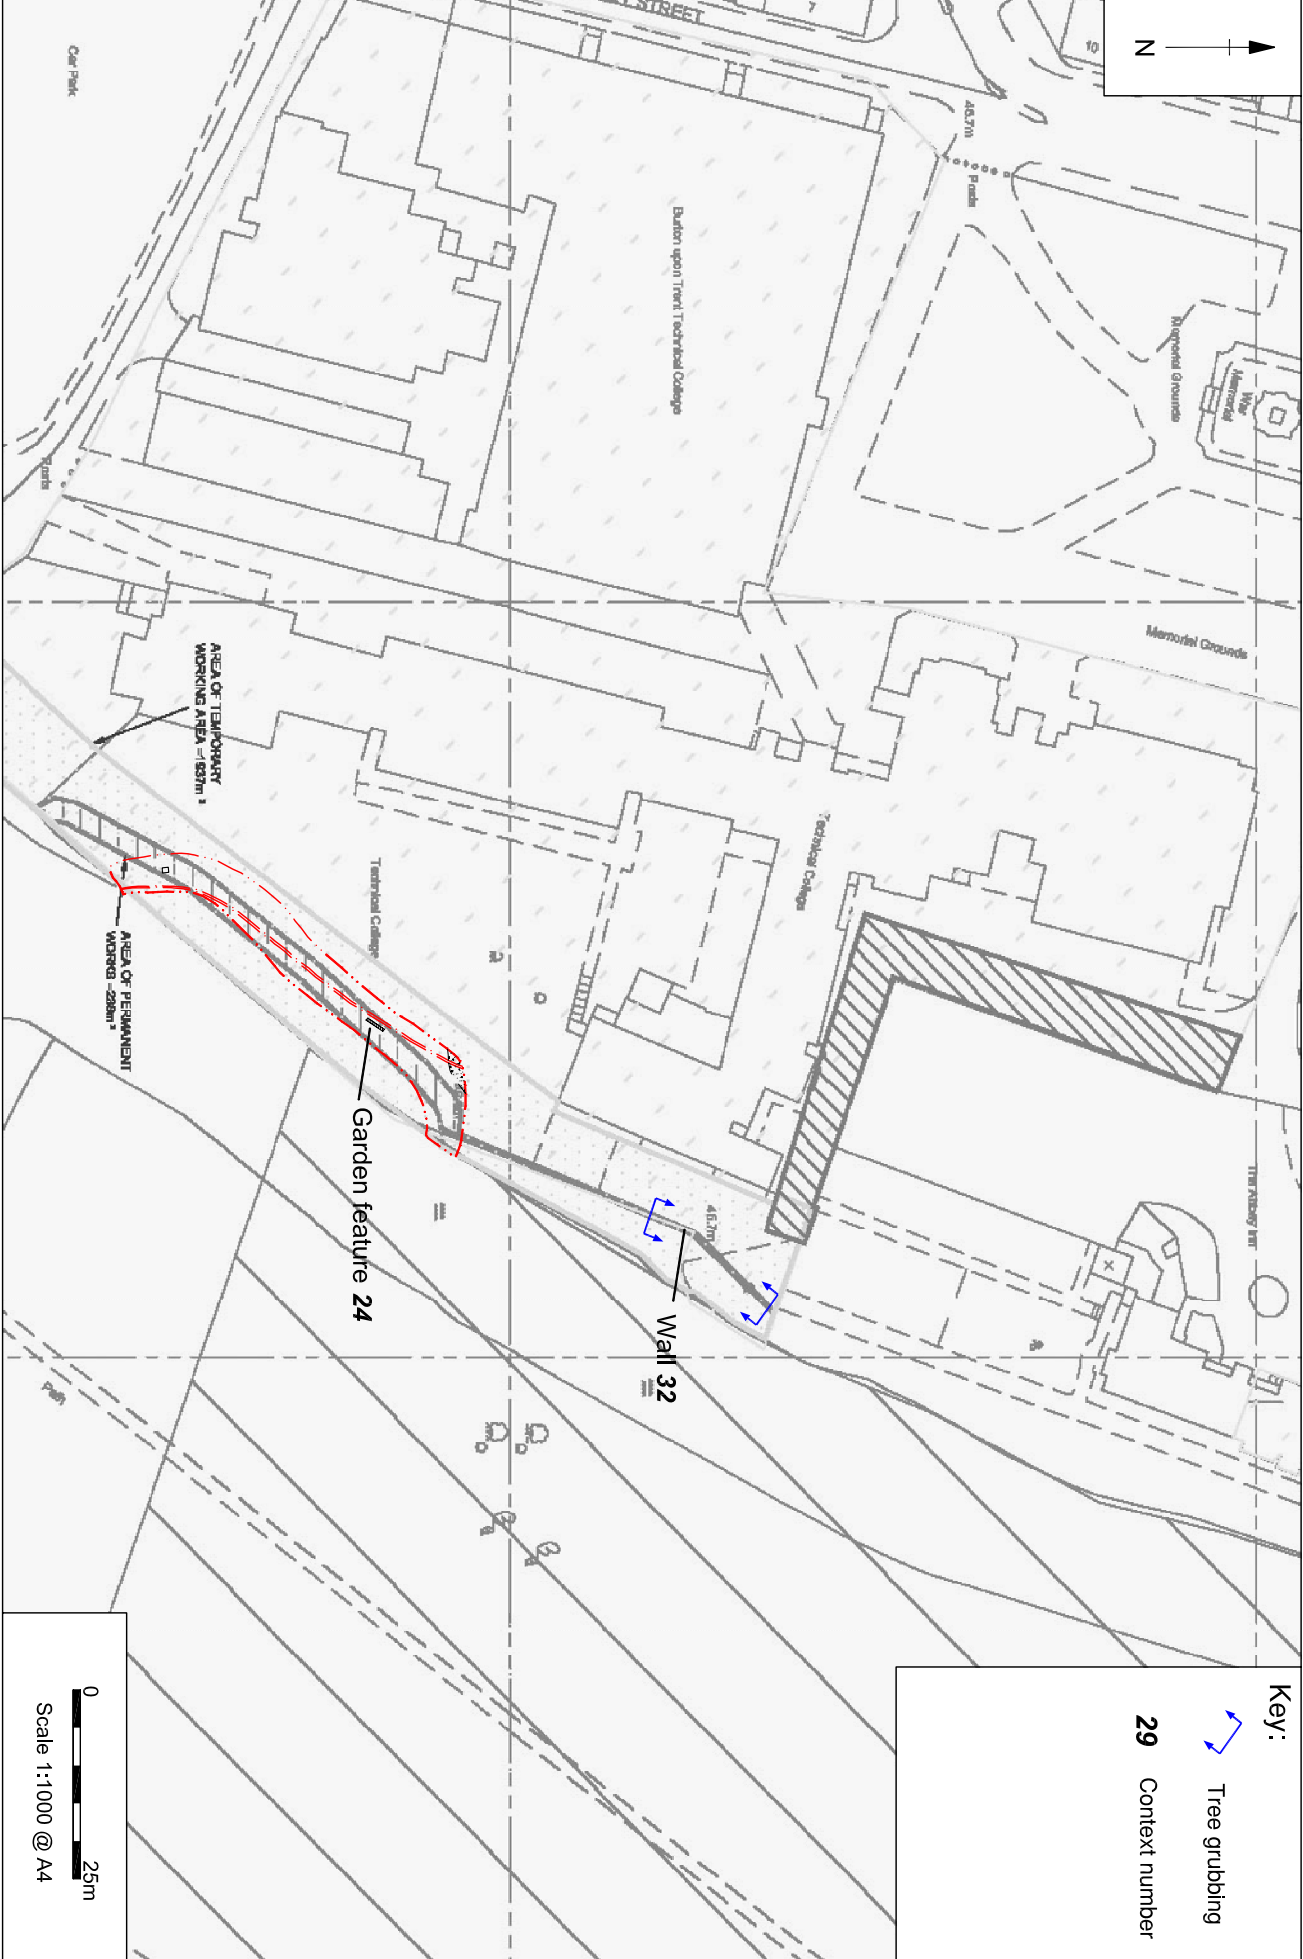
Plan of College site showing location of groundworks and position of features 24 and 32
